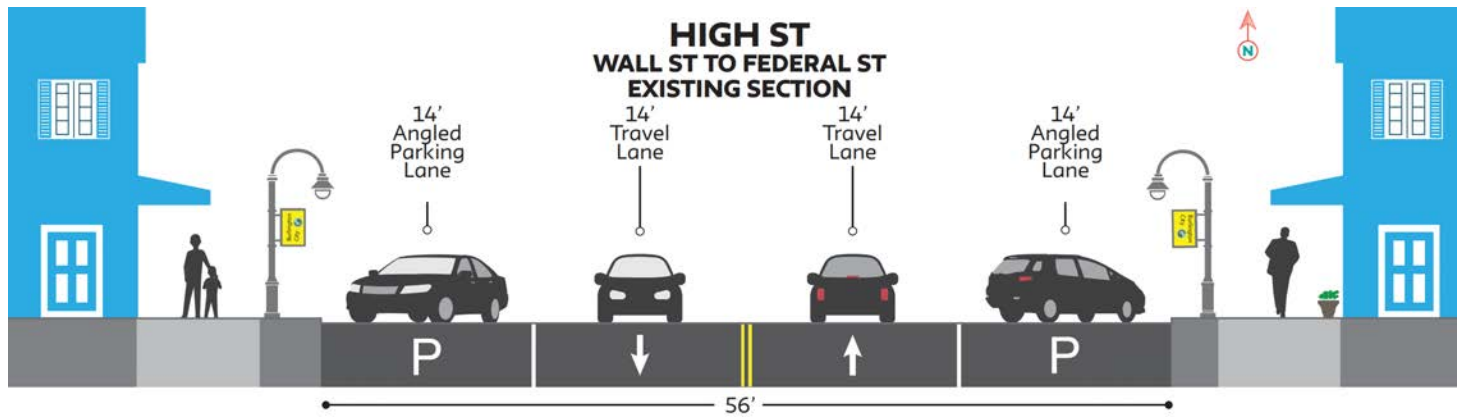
Existing Cross Section High Street - Wall Street to Federal Street
